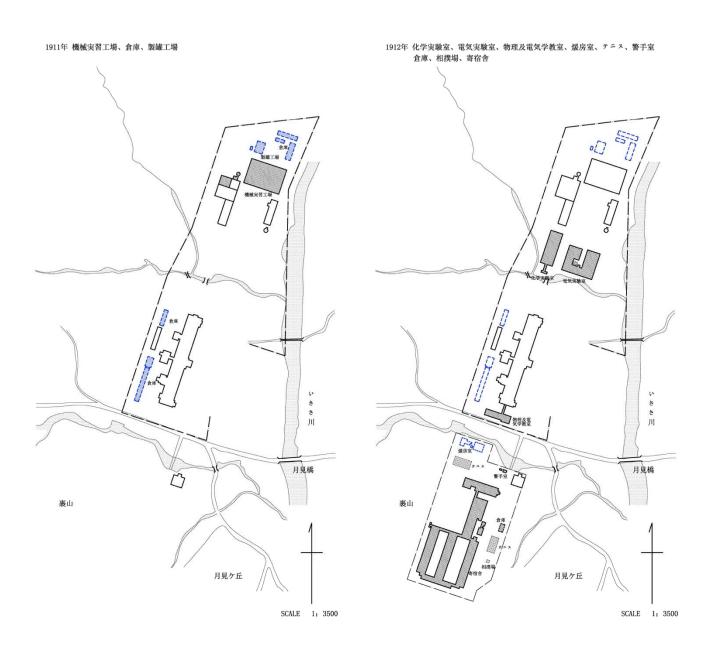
Retraced Campus Site plans of the RCE before 1945
